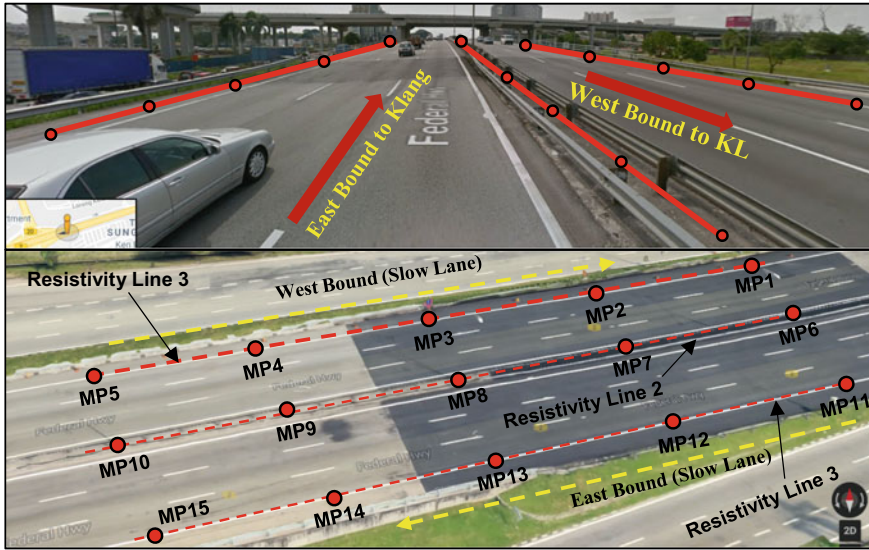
Layout location plan of JKR Probe and Resistivity Line at the proposed site
